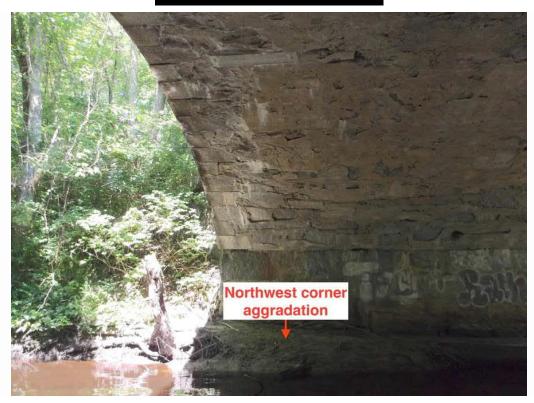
West side, looking North, concrete cover deterioration and aggradation.
